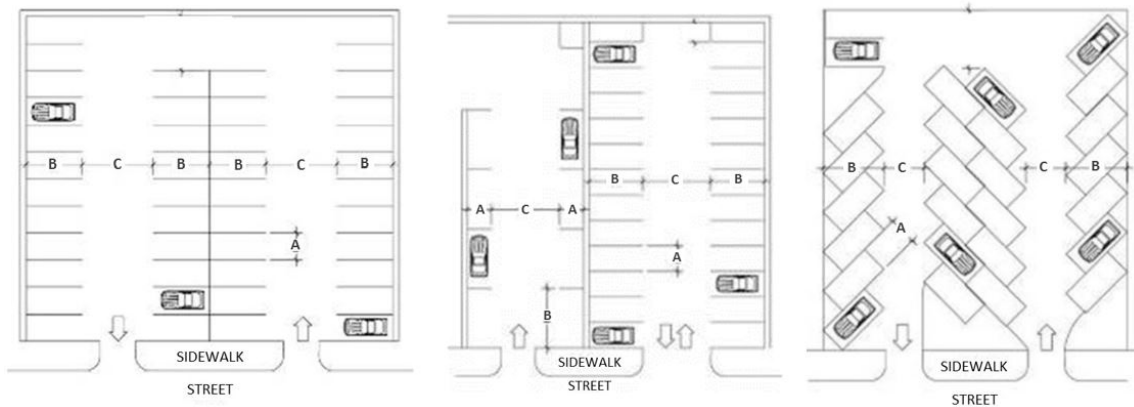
Parking Space and Drive Aisle Dimensions
